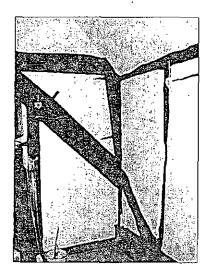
Room 14, bedroom. North-east corner of room showing timber frame construction
